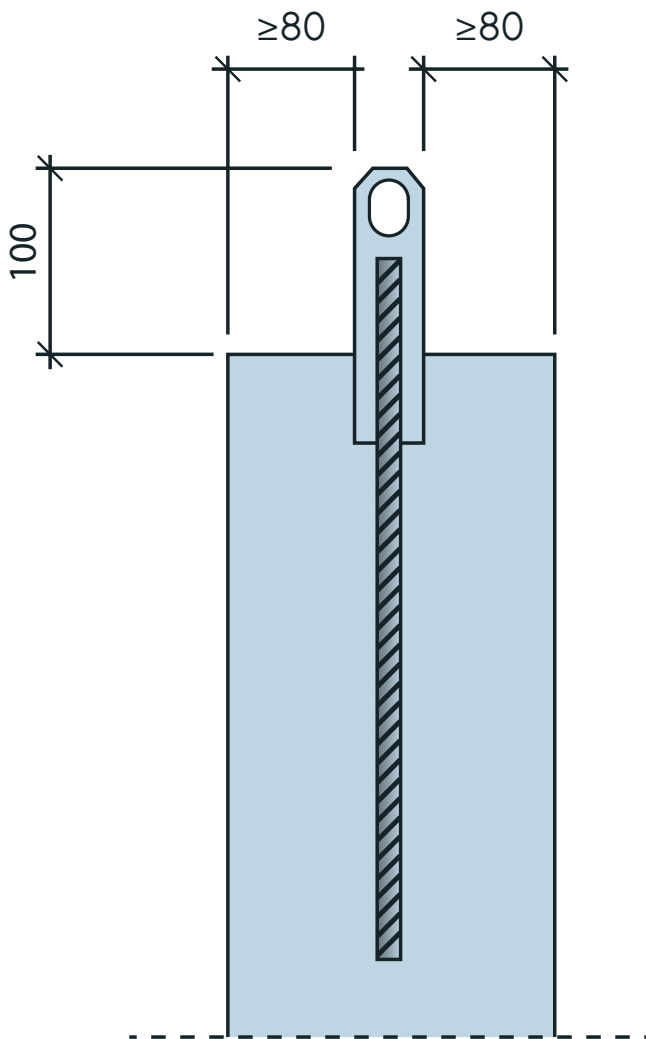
RCL lifting parts placement in column [dimensions in millimeters]
